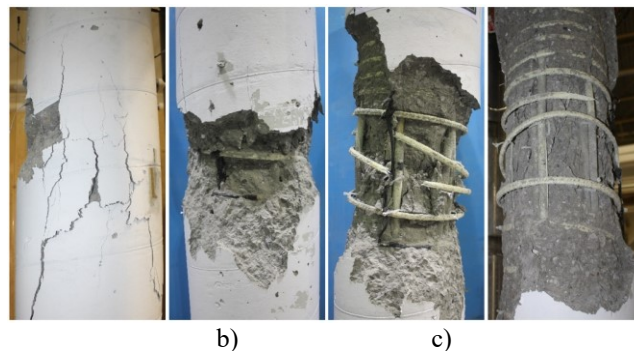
Typical failure mode: (a) concrete-cover spalling, (b) concrete crushing, (c) rupture of GFRP stirrups, and (d) GFRP-bar buckling.
